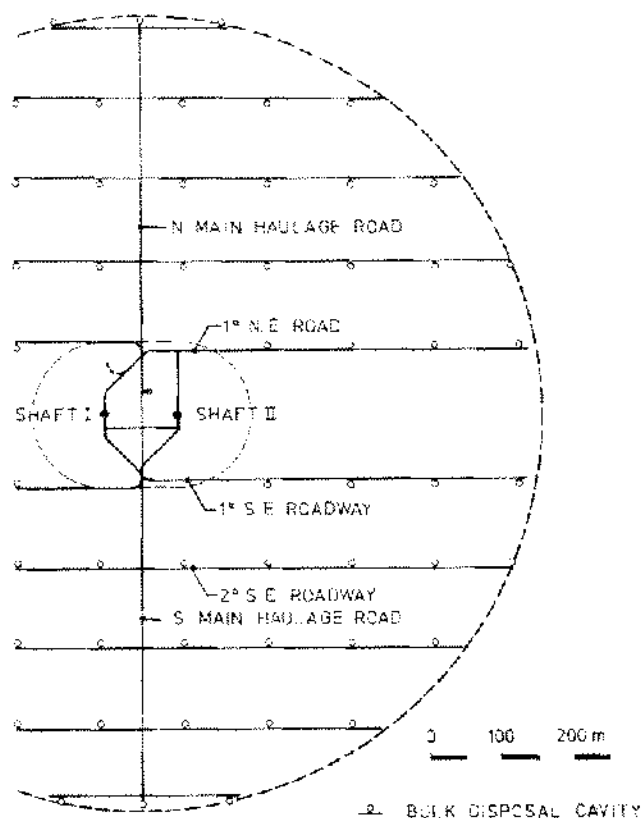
Schematic plan of bulk disposal area at -500 m level.
